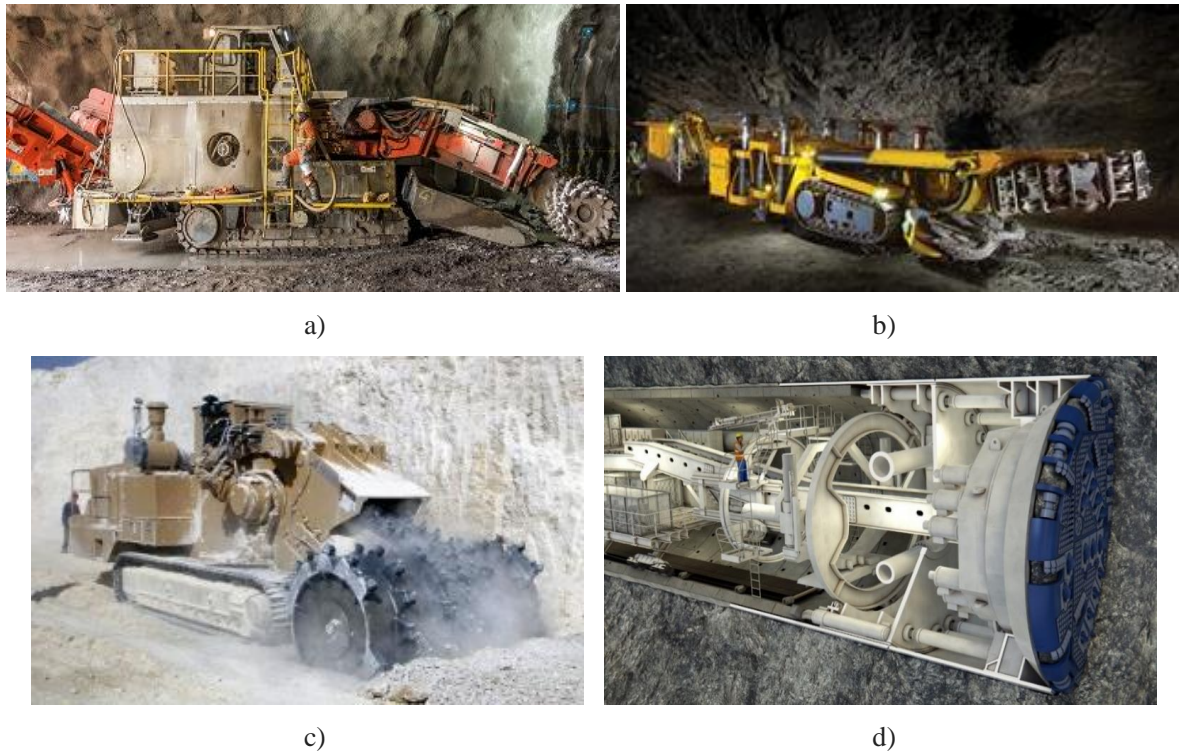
Various hard rock winning machines: (a) Roadheader (RH), b) Continuous Miner (CM) c) Surface cutting machine (SCM), d) Tunnelling machine (TBM),
